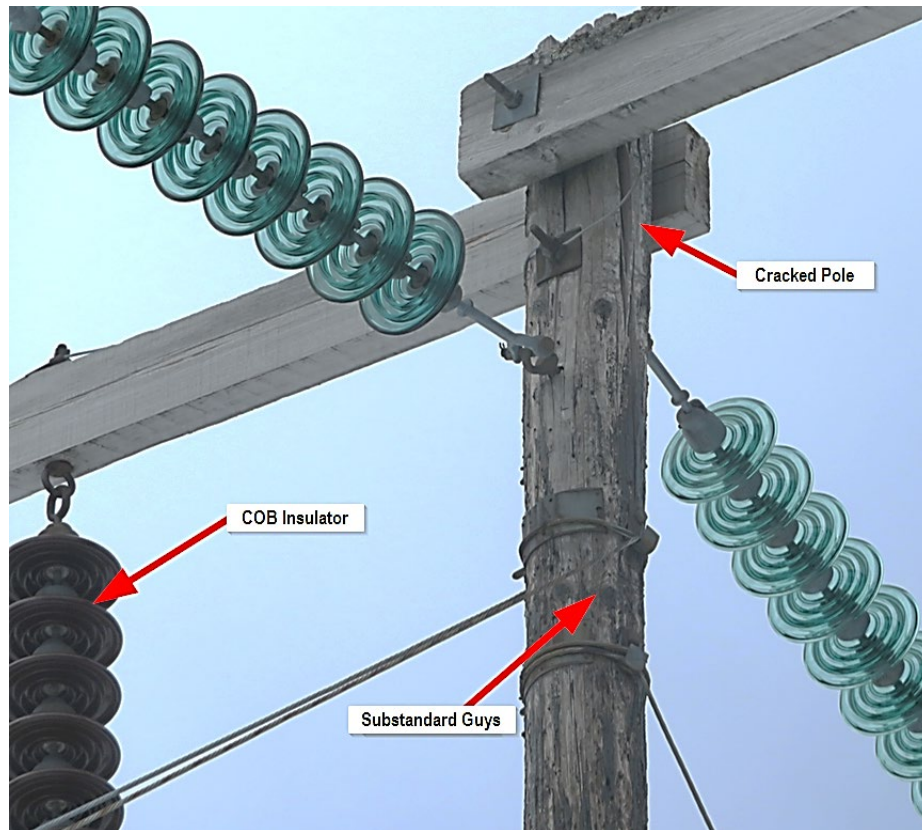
Deteriorated Pole, Sub-standard Construction and COB Insulator
